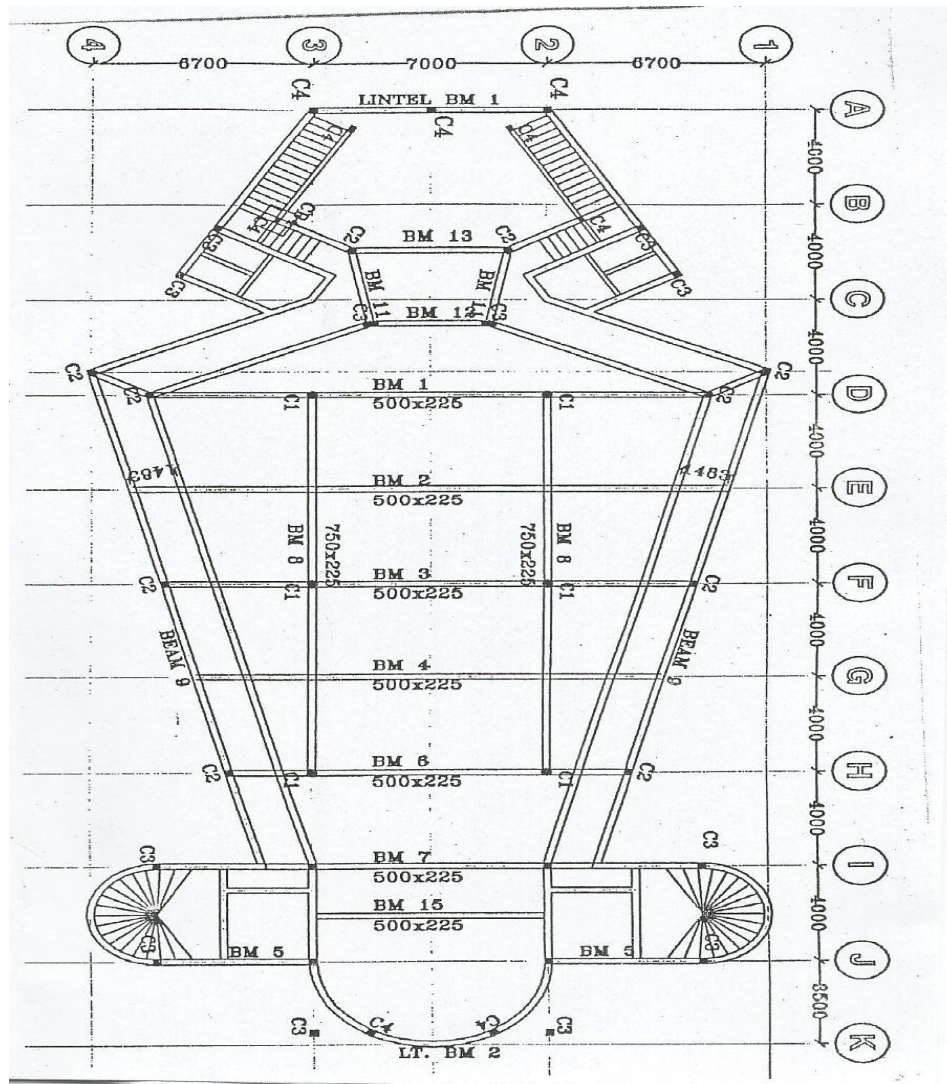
Beams and Columns Layout of the collapse St. Thomas's Church Hall.
